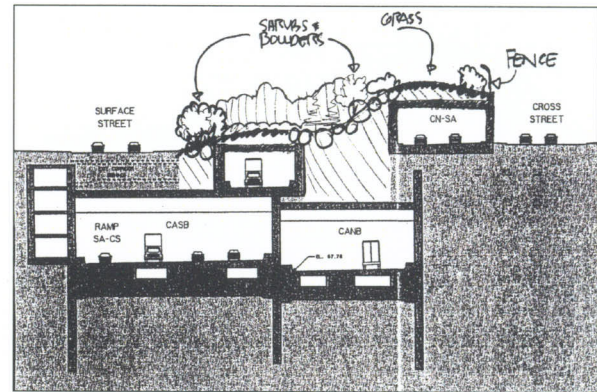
Tunnel cross-section illustrates "Olmstedian" park over ramp covers, with lightweight fill in the deepest areas.
